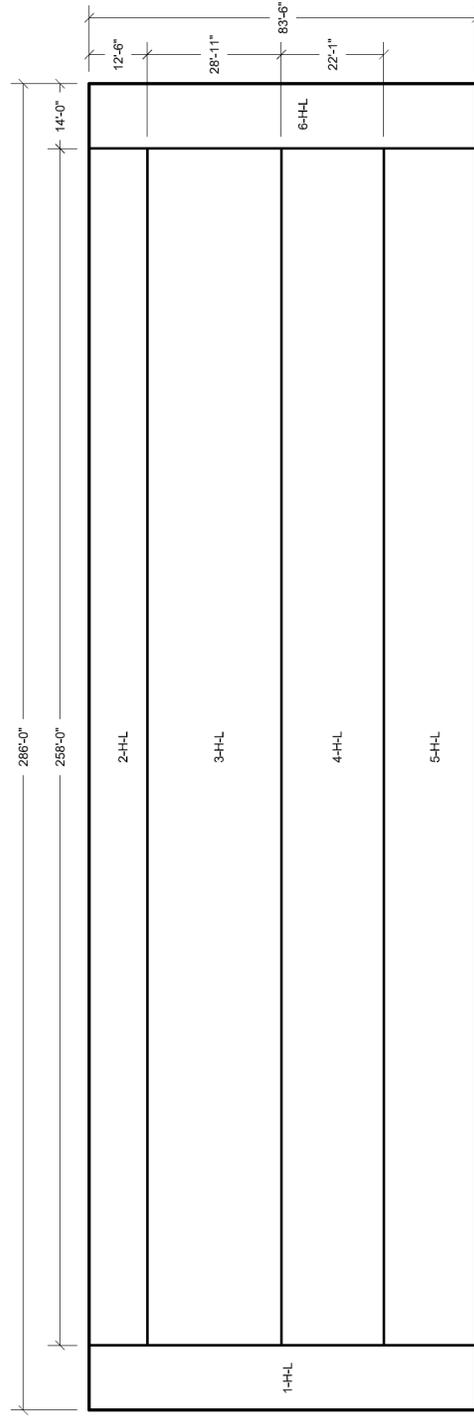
H.6-38: UHS BASIN SOUTH WALL LOOKING NORTH
